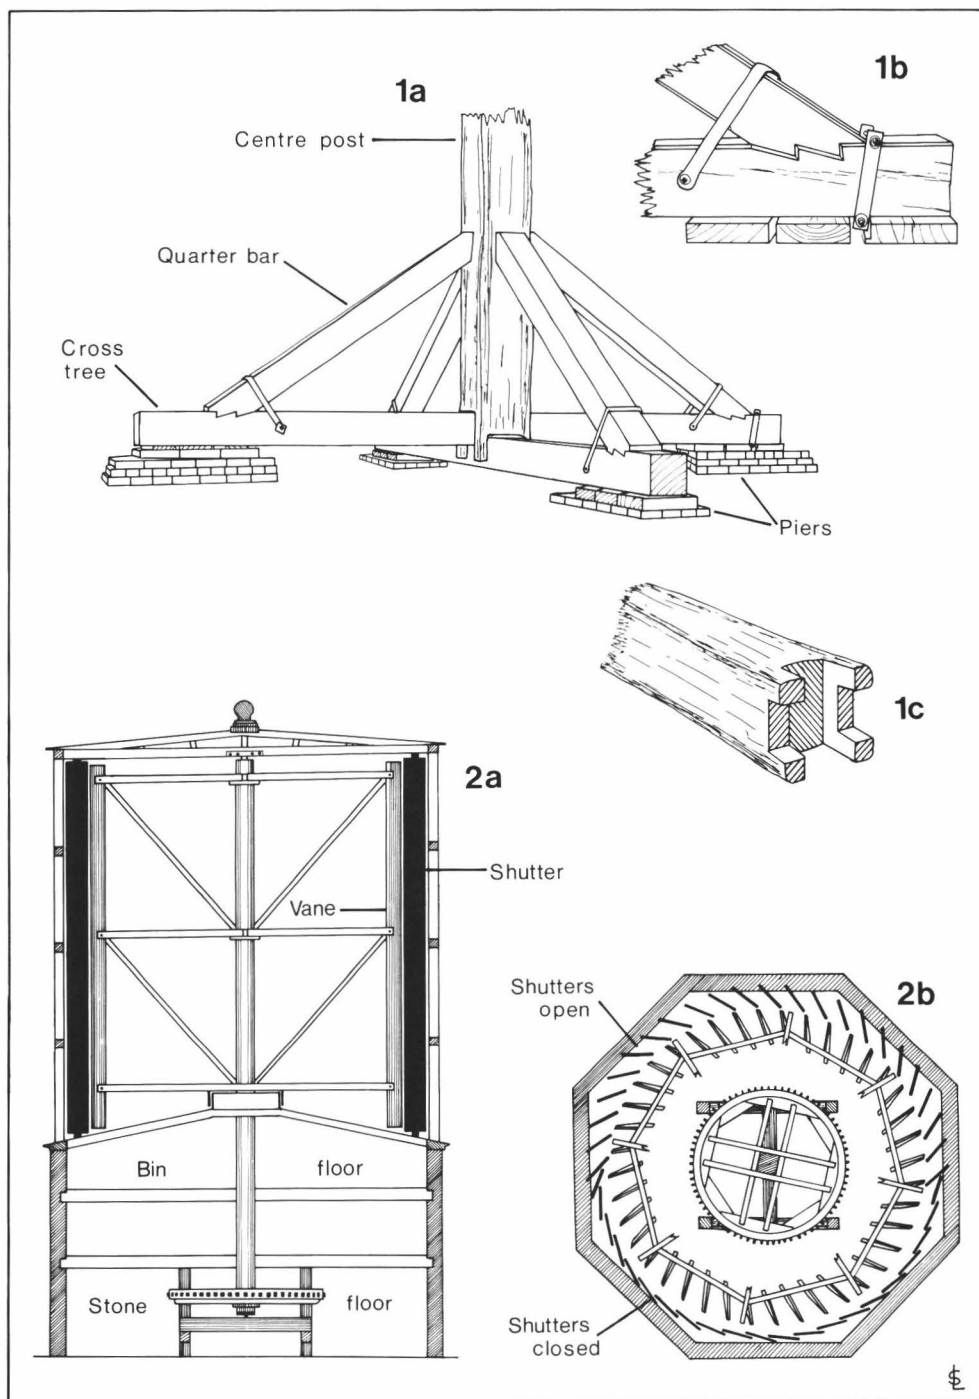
1a. Typical postmill trestle showing cross-trees, quarter-bars and centre post. 1b. Detail of double abutment and tenon joint. 1c. Detail of mortice and horns of centre post. 2a. Section and 2b Plan of Horizontal Turbine mill based on drawings published in Ree's Cyclopaedia.
